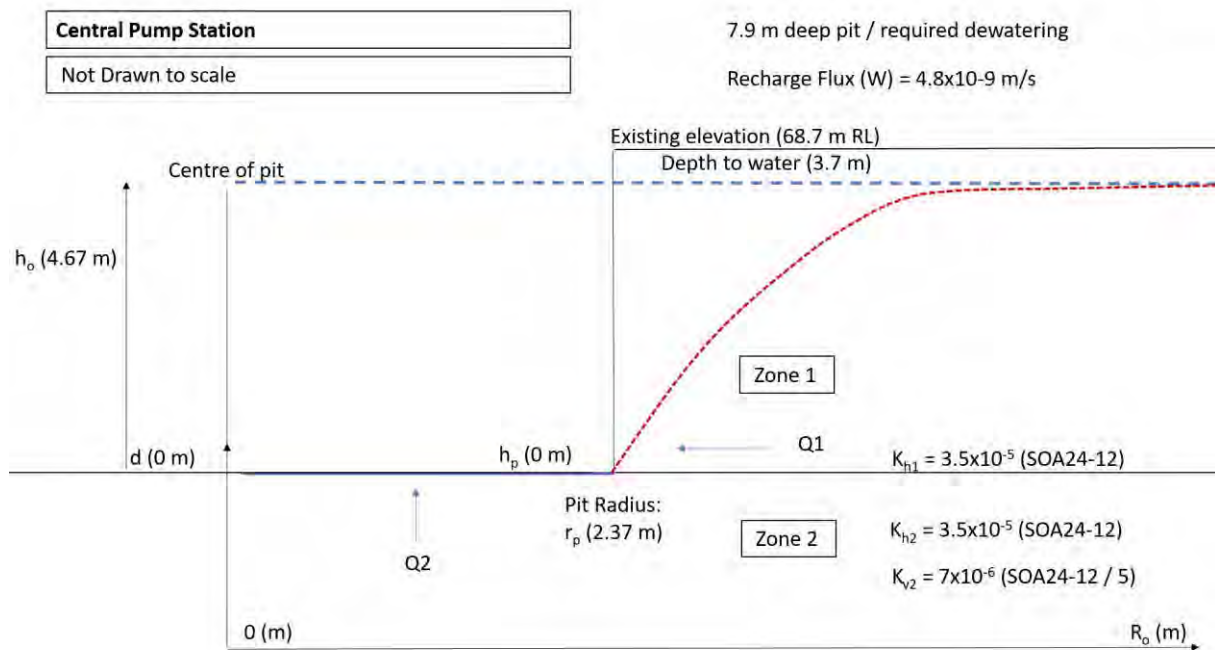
Inputs for Pit Model Assessing Dewatering of Planned Central Wet Well Install
